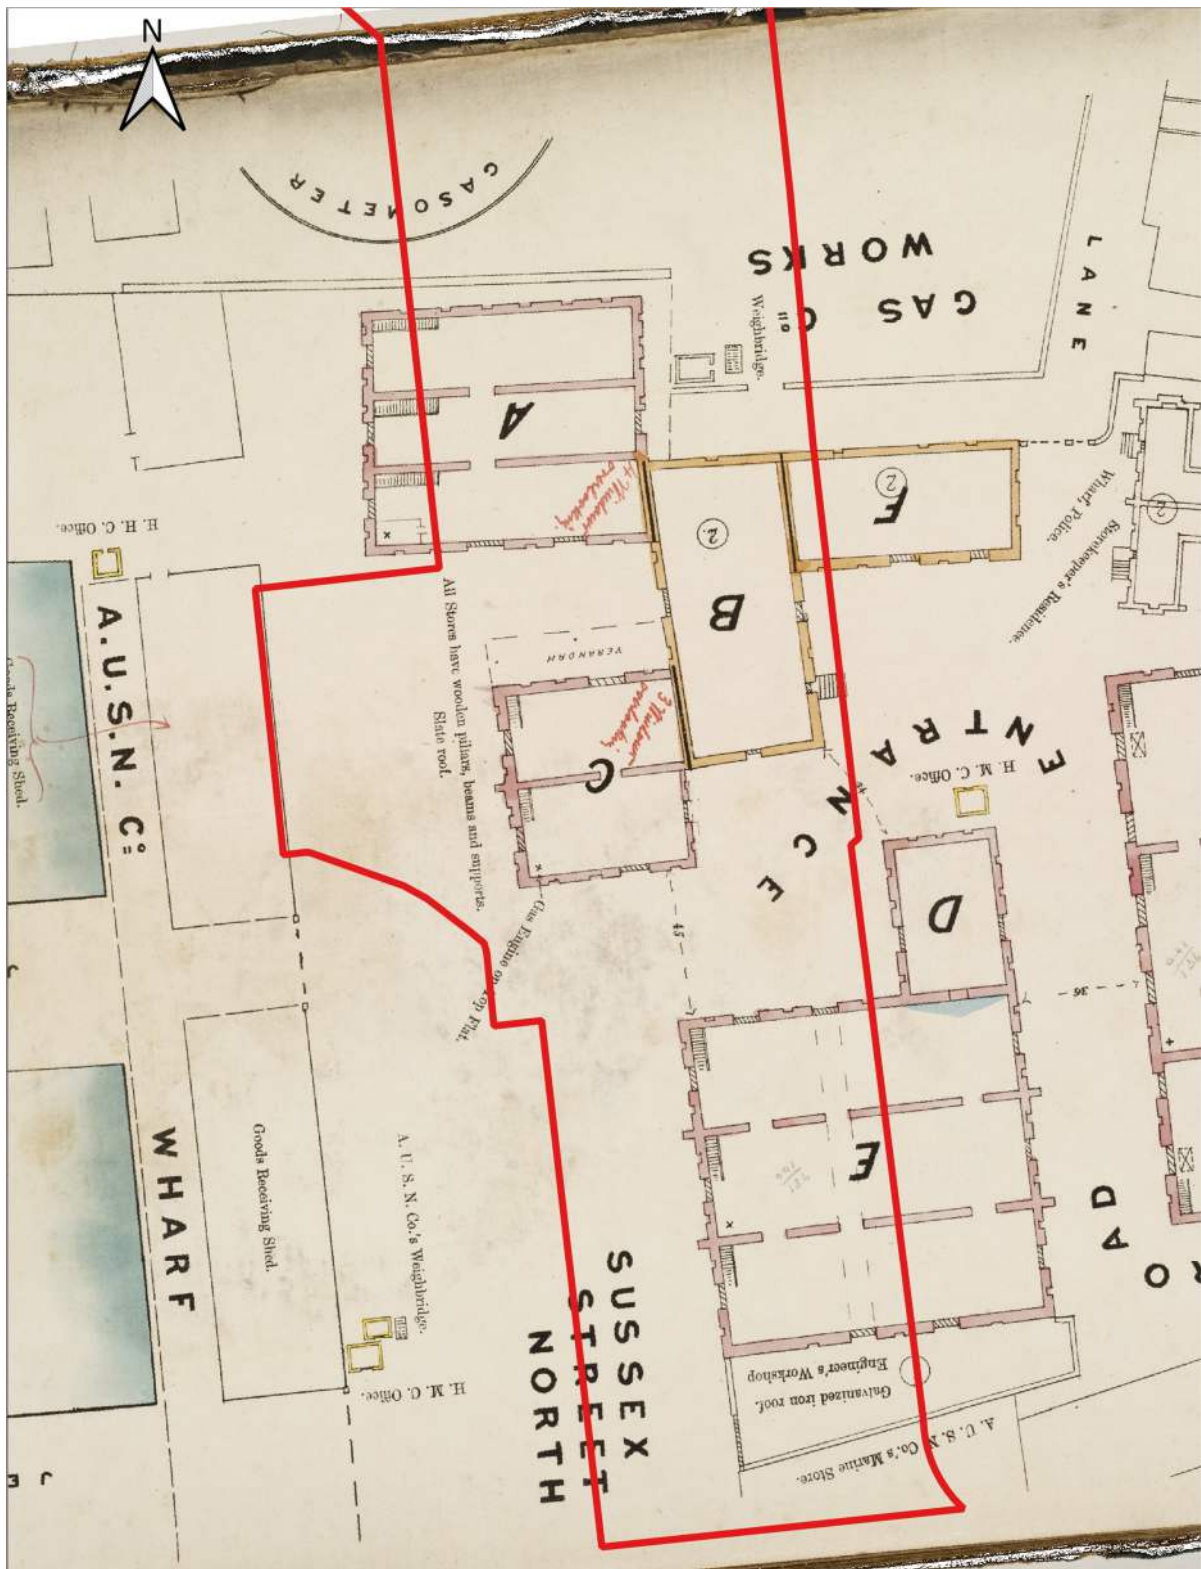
1894 sketch plan of the Grafton Stores and adjacent wharfage. Building stores B, C, E, and parts of A and F are within the study area (red outline). G Mahlstedt, 'Sydney Bonded and Free Store Plans', ML, pg. 11, 1894 MAX 811.17/1894/1.
